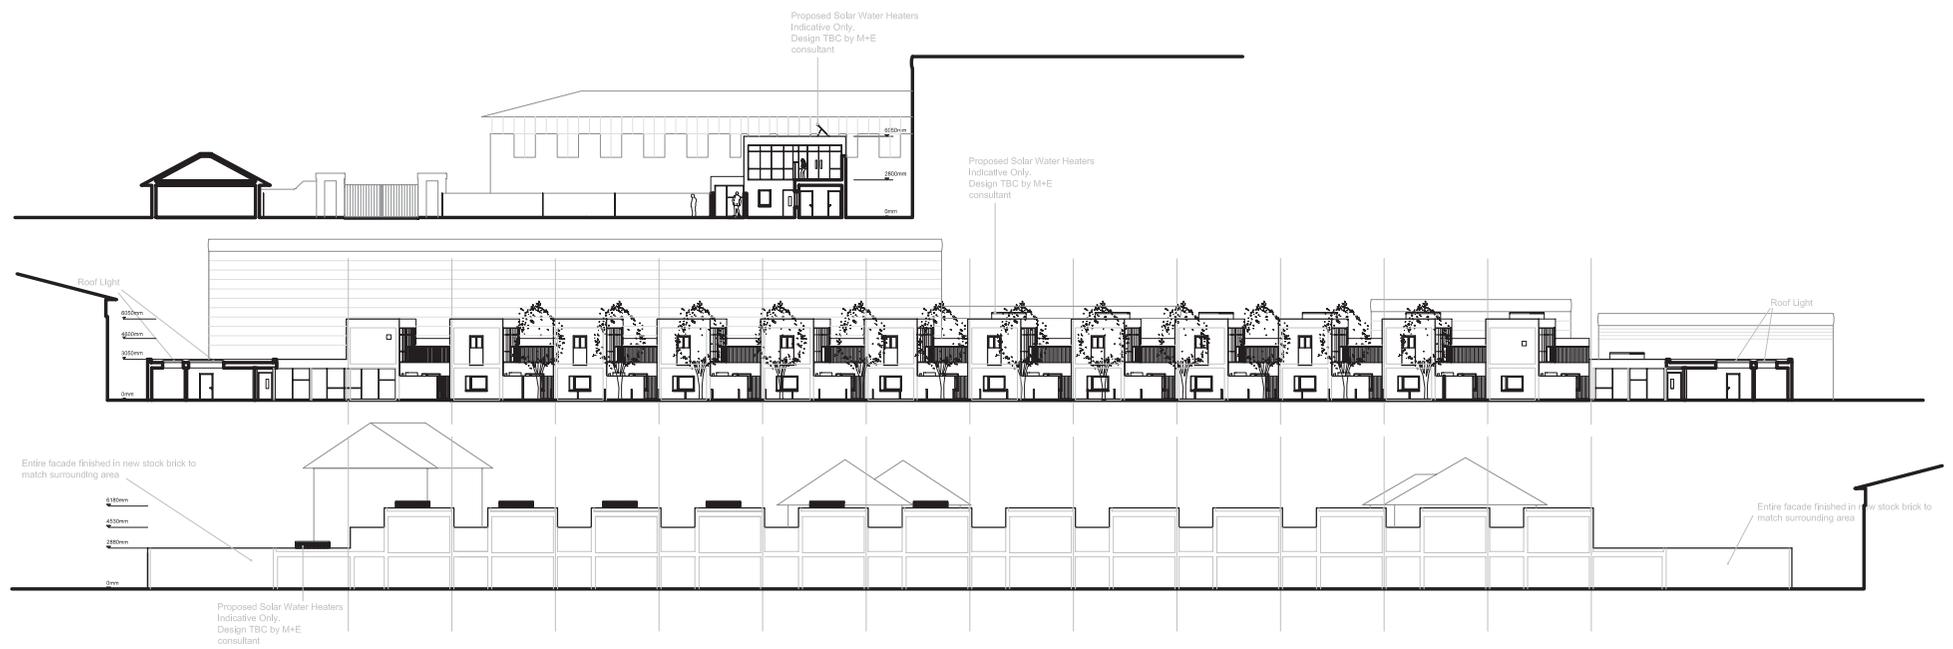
Baden Powell Close: Sectional Elevation 1.
